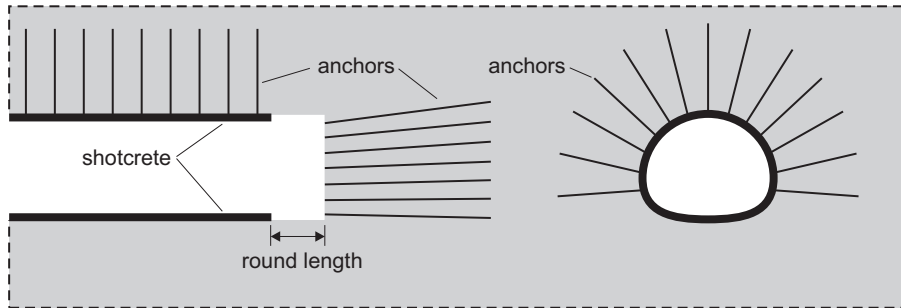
Principals of conventional tunnelling to control ground stability and ground deformation: Systematic use of shotcrete and anchors
